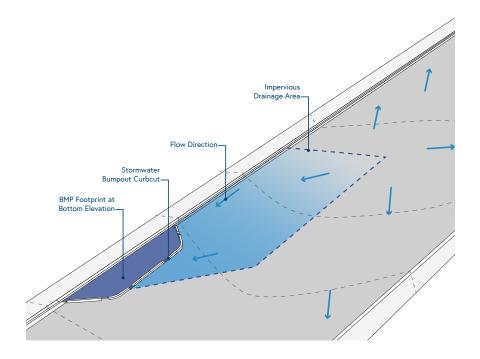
Illustration of Impervious Drainage Area and Bmp Bottom Footprint
